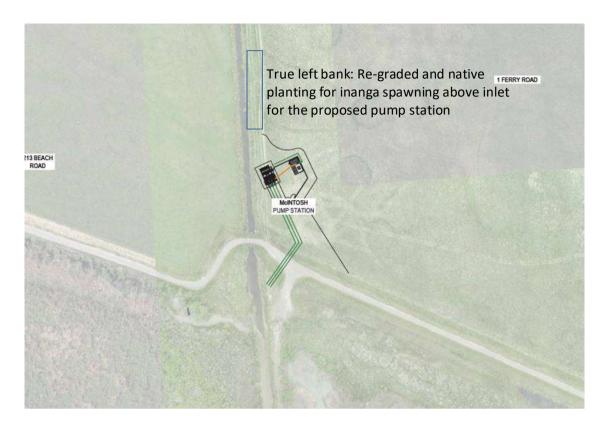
The location of the proposed bank re-grading, followed by native planting on the McIntosh Drain, north of a proposed pump station.
